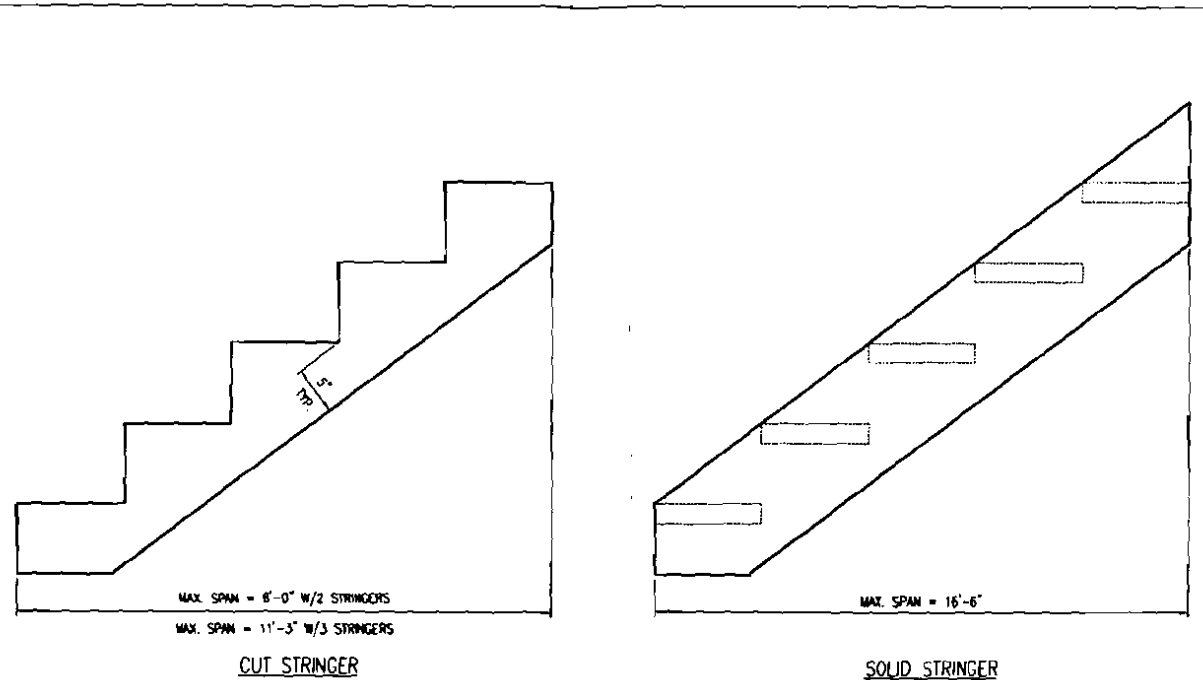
STAIR STRINGER REQUIREMENTS
